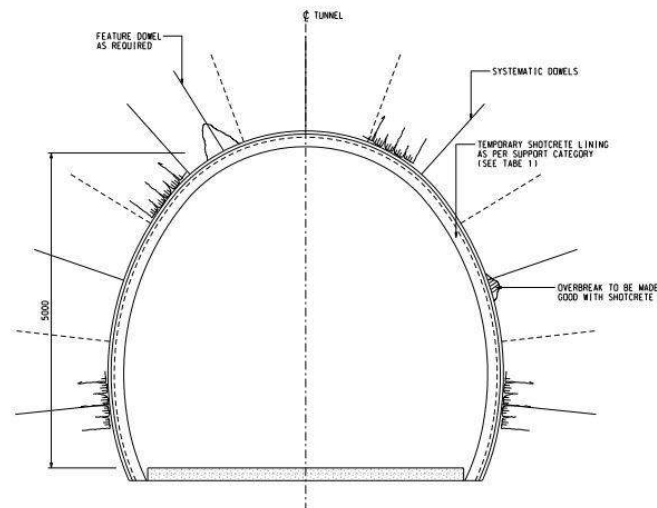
Typical temporary and permanent supports of underground storage chamber in rock
